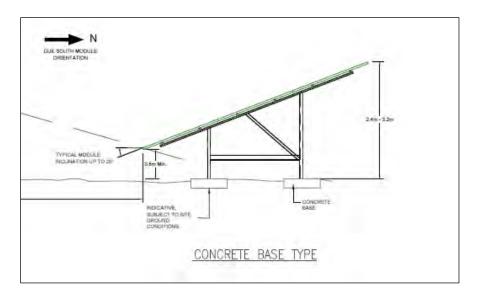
Typical Cross Section - Shallow Concrete Base Mounting System
